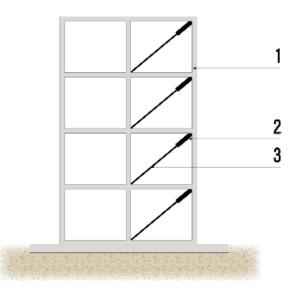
A frame building of columns and beams (1) with dampers (2) at the tops of diagonal braces (3).
